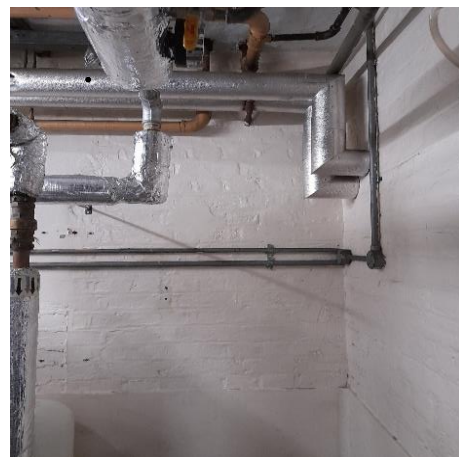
Piped Services Penetrations Through Wall in Boiler Room
